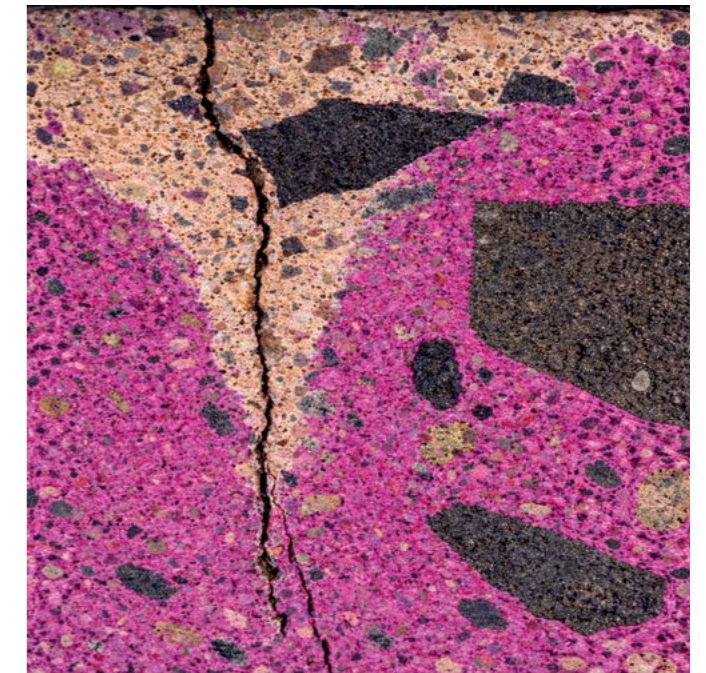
Digital image showing a sectional view of high pressure crack injection
